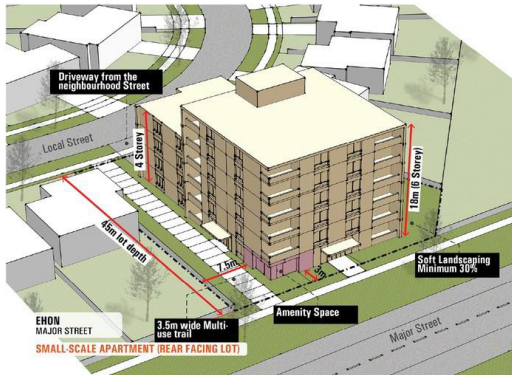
Image of an apartment building located on a through-lot on a major street and local street.
